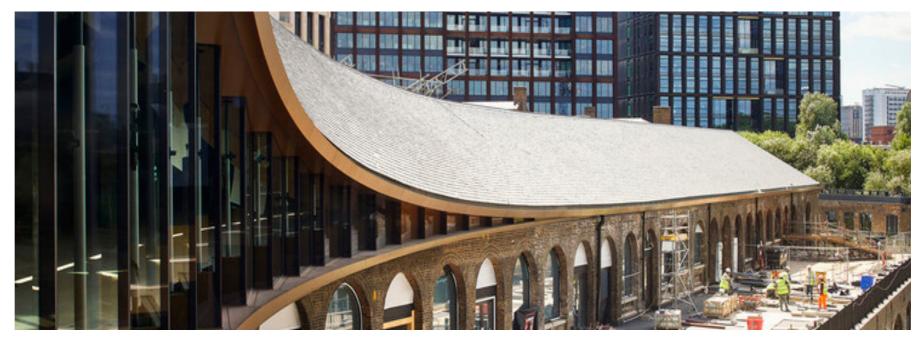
(opposite): Section through the Coal Drops showing their original configuration (Source: Thorne, 1990) Figure 15 (above): The new curved slate roof looking south east
